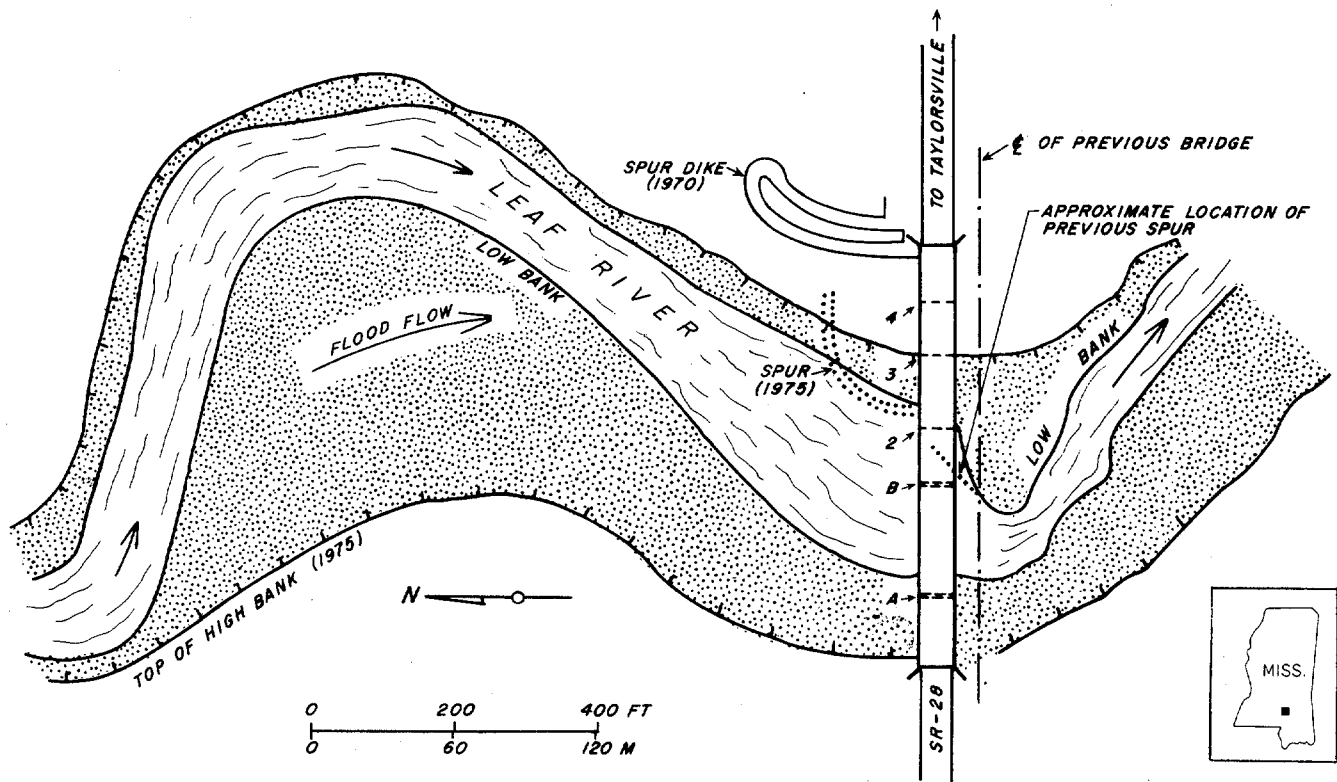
Plan sketch showing countermeasures at SR-28 crossing.
